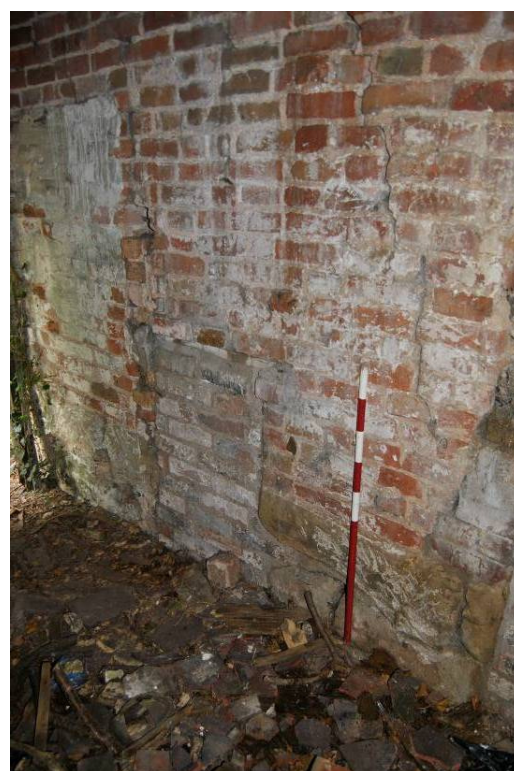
[G1a]; blocked door formerly serving outlet 2.
